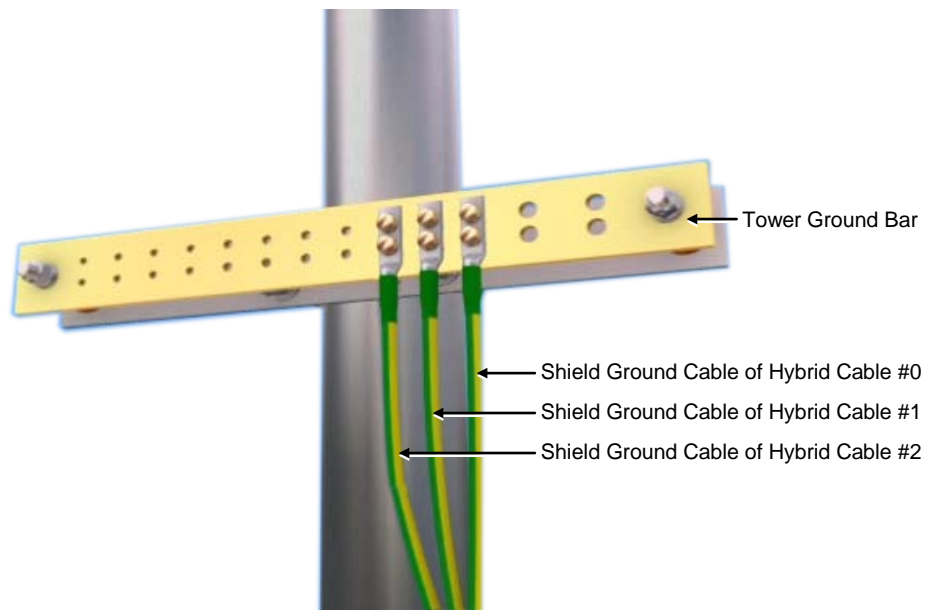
Hybrid Cable Shield Grounding Connection_Tower Ground Bar
